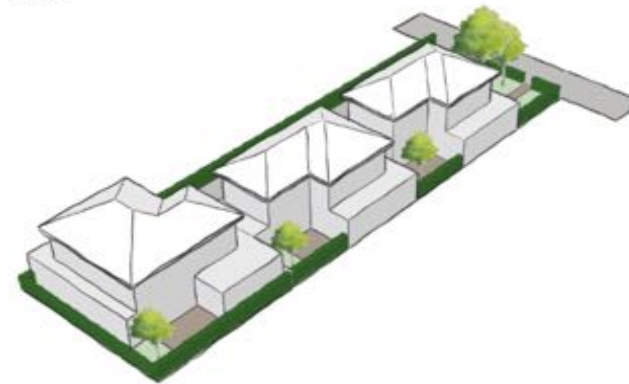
Typical townhouse development constructed without the new 35% minimum garden area requirement.
